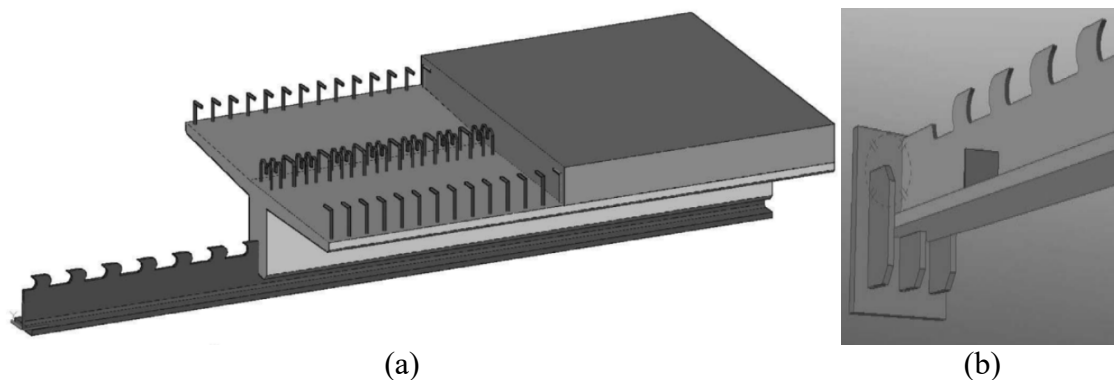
3D rendering of VFT-WIB®: (a) bridge deck/girder system; and (b) end detail (Petezek et al., 2015)
